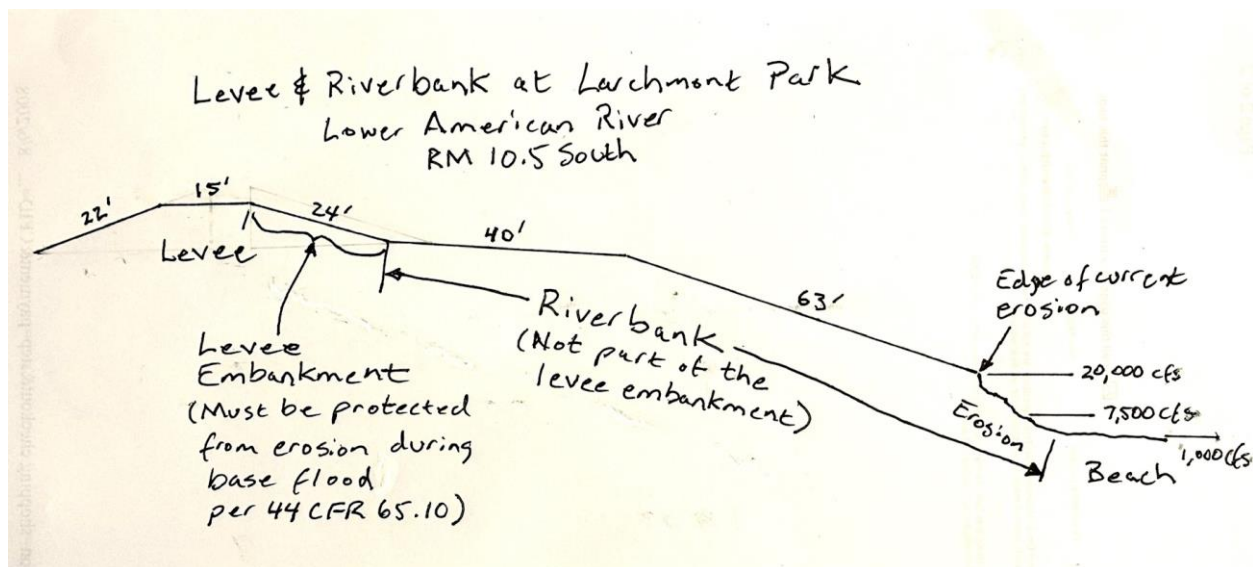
American River Erosion Contract 3B South Site 4-1 Details
